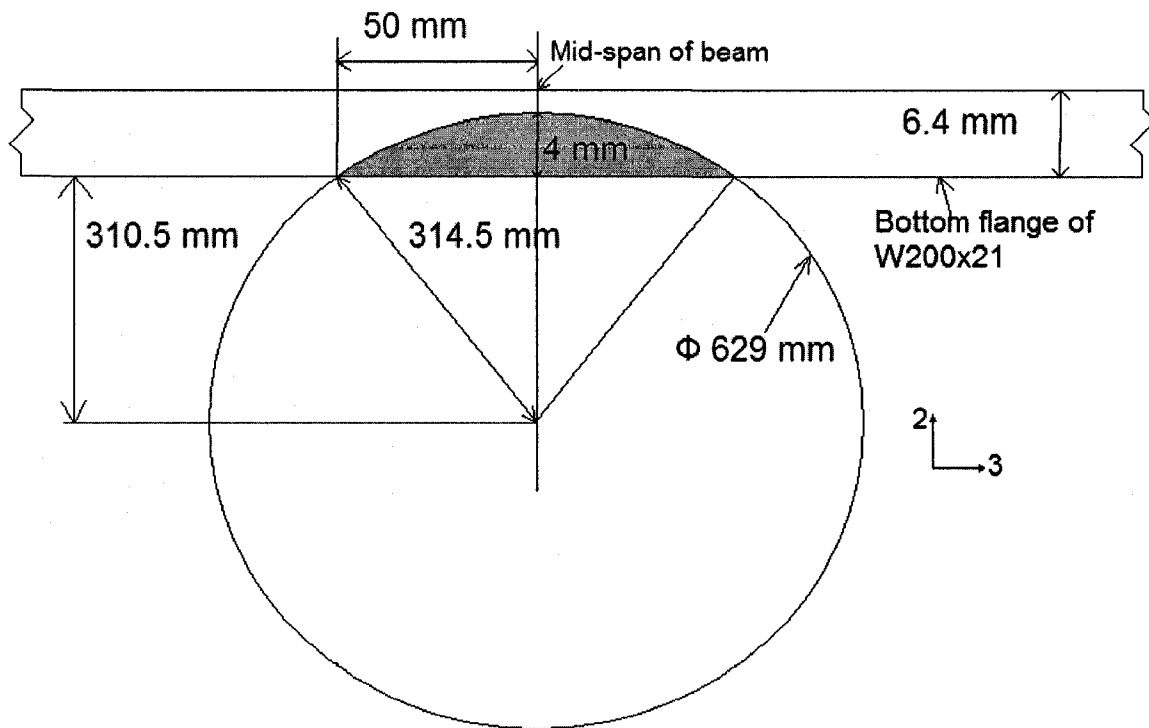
Detail of the corrosion geometry (cross-sectional view)
